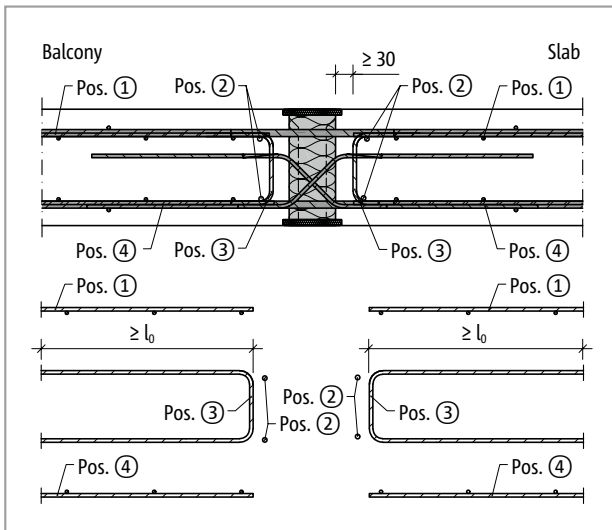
Schöck Isokorb® T type D: On-site reinforcement
